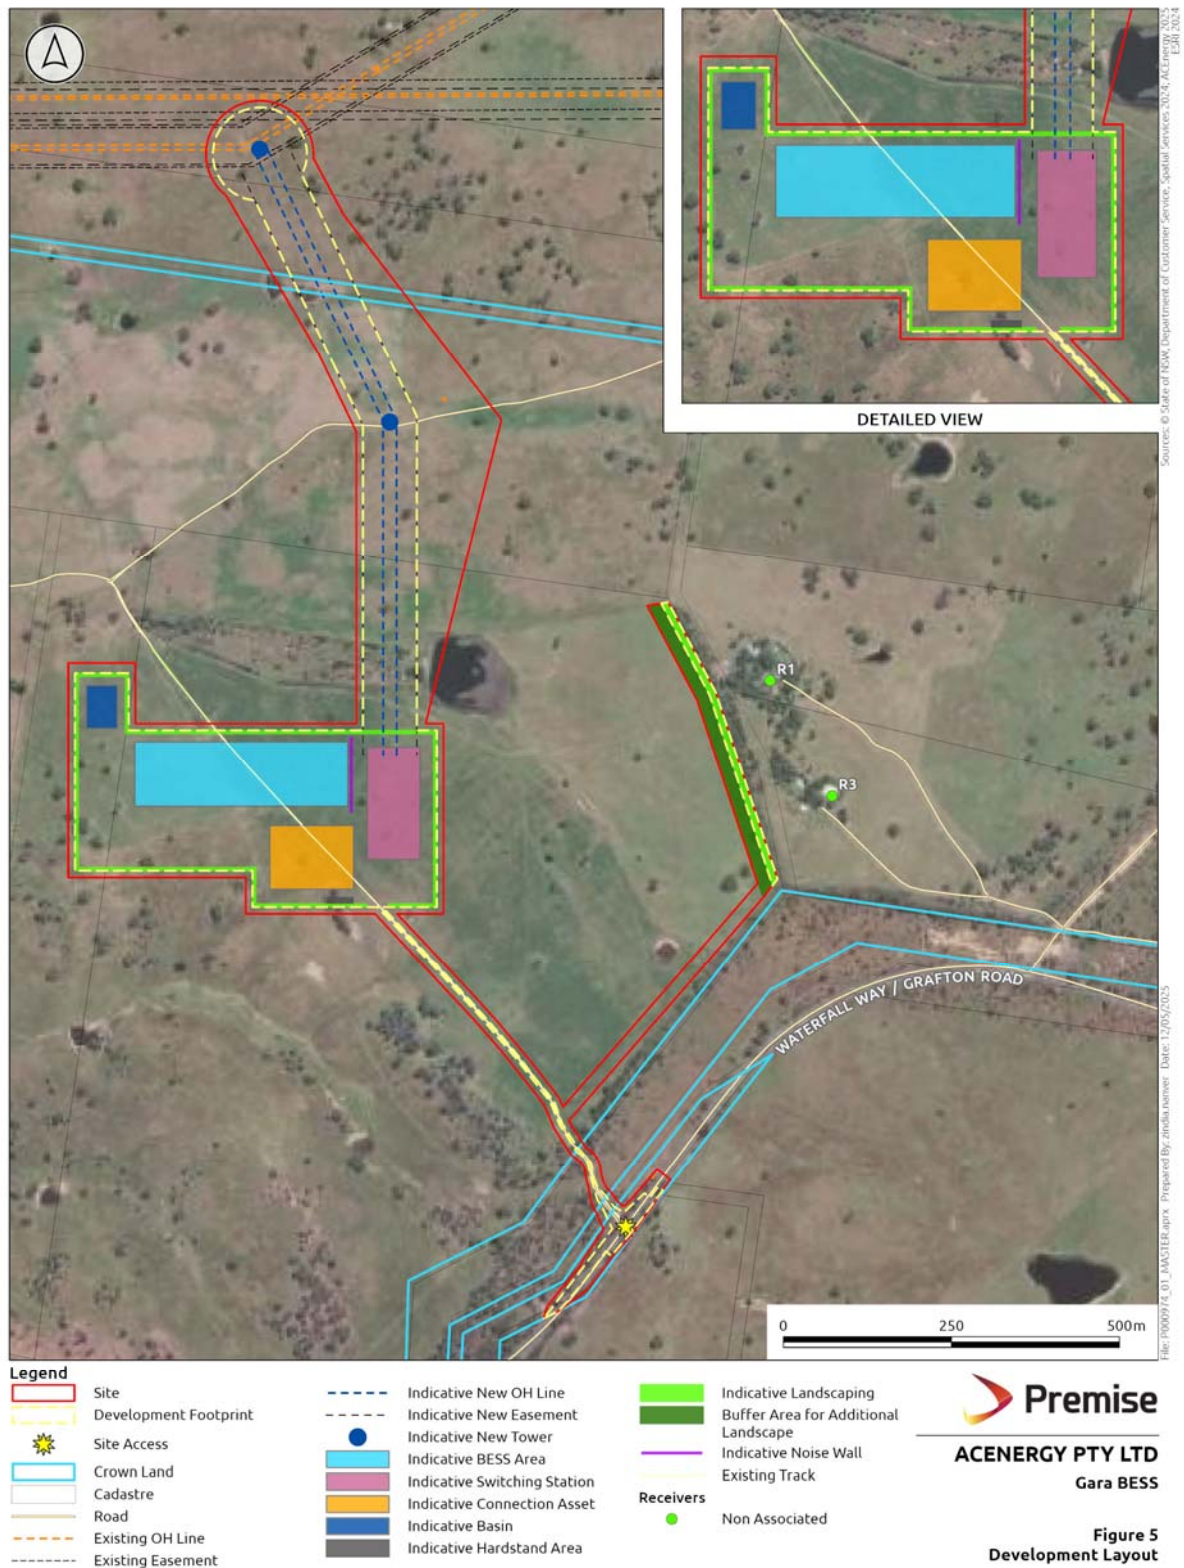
Site plan in detail (from ACenergy, 5.5.25).
